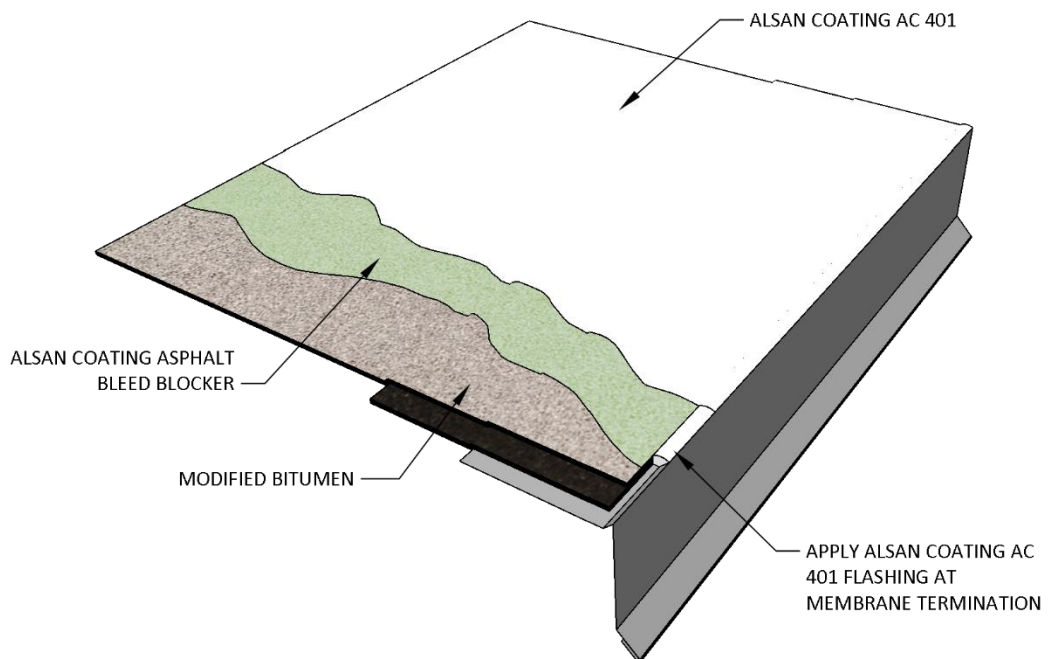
Acrylic Roof Coating Over Modified Bitumen, Edge
